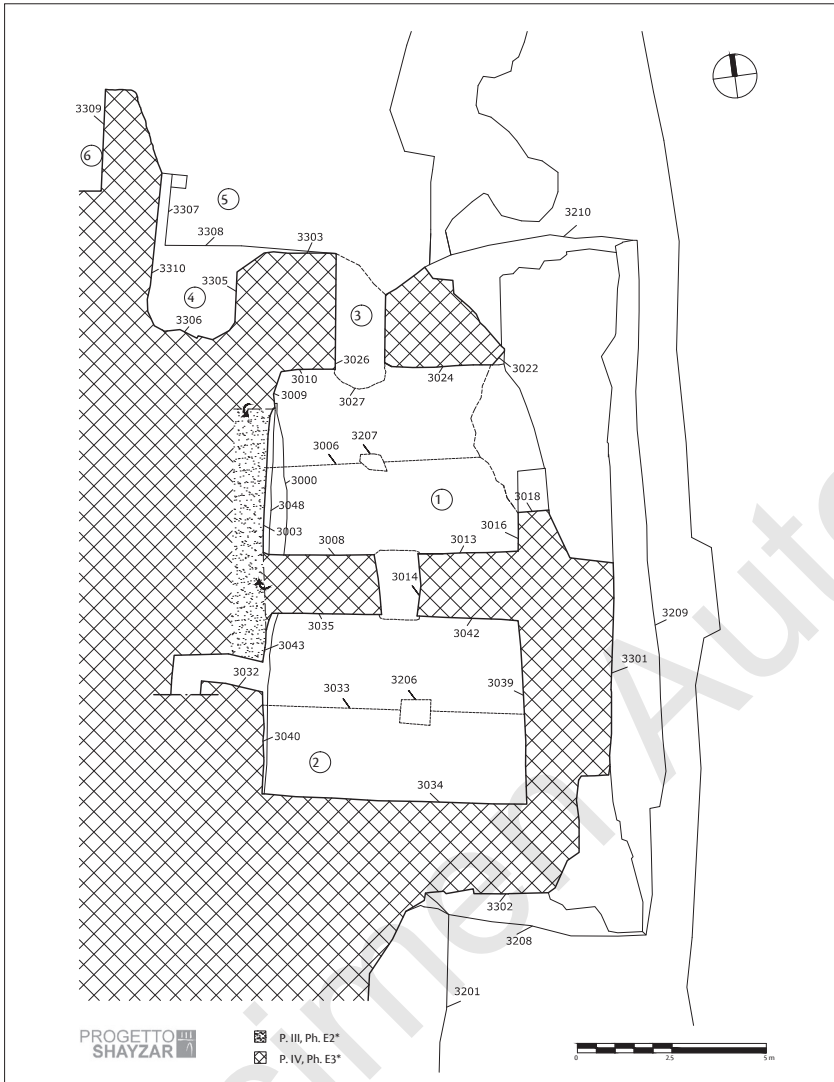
Eastern front, tower CF16, plan (Copyright Progetto Shayzar).
